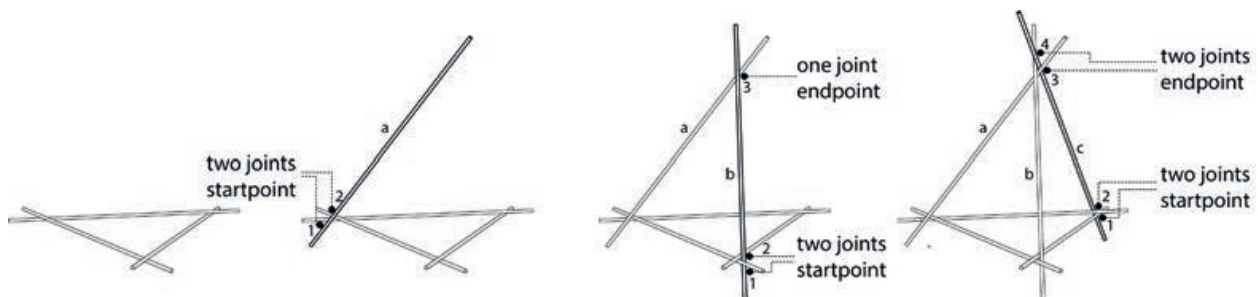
Sequential adding of three bars onto an existing structure leading to two joints, three joints and four joints.
